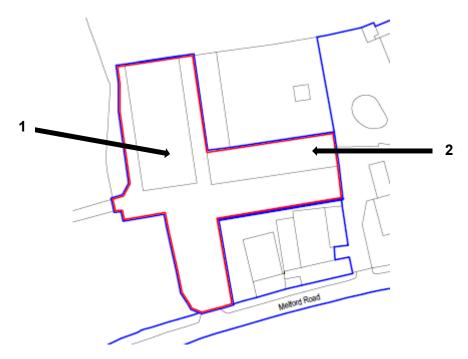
illustrating the extents of the change of use on site, and the specific uses of the buildings on the site.
